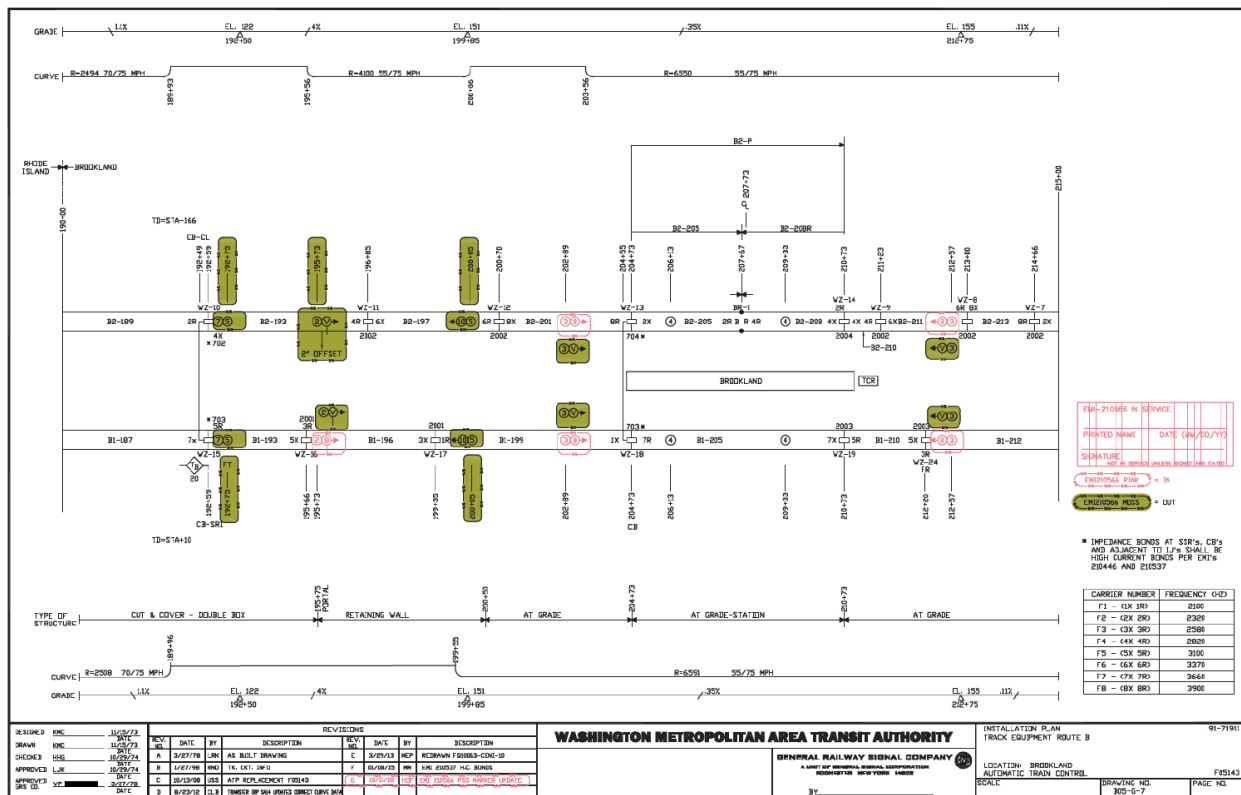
Signal Engineering Book of Plans Drawing B05-G-7.
